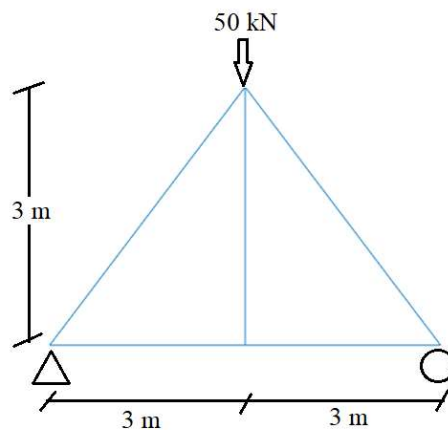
Optimal Truss Structure of Eleven Elements Truss
